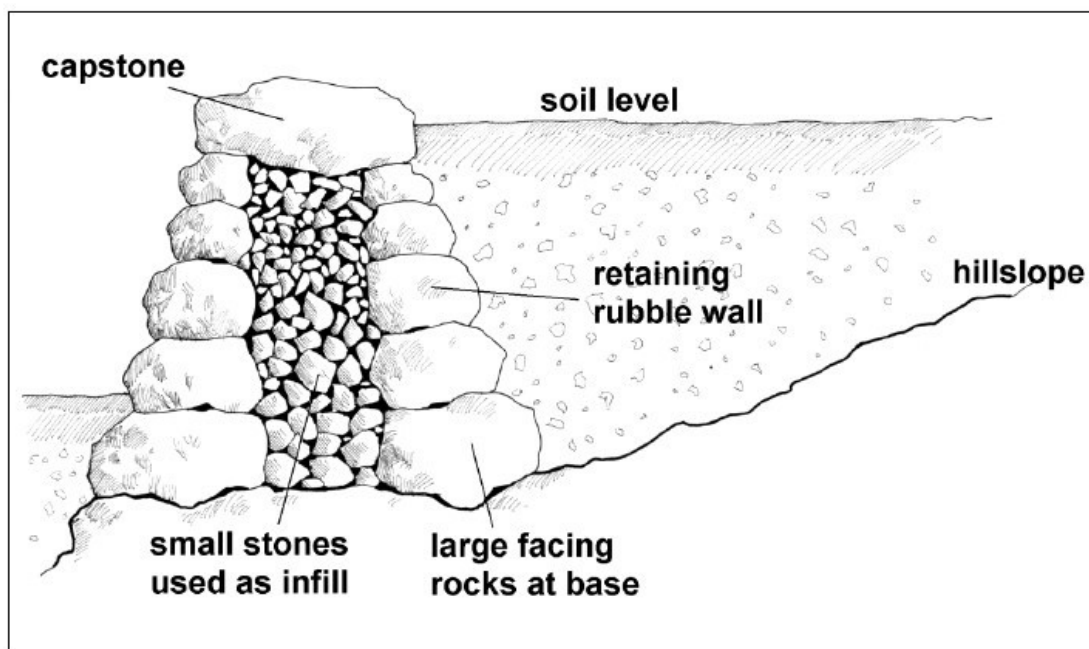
Rubble wall cross-section showing internal fill (Role' and Attard)
